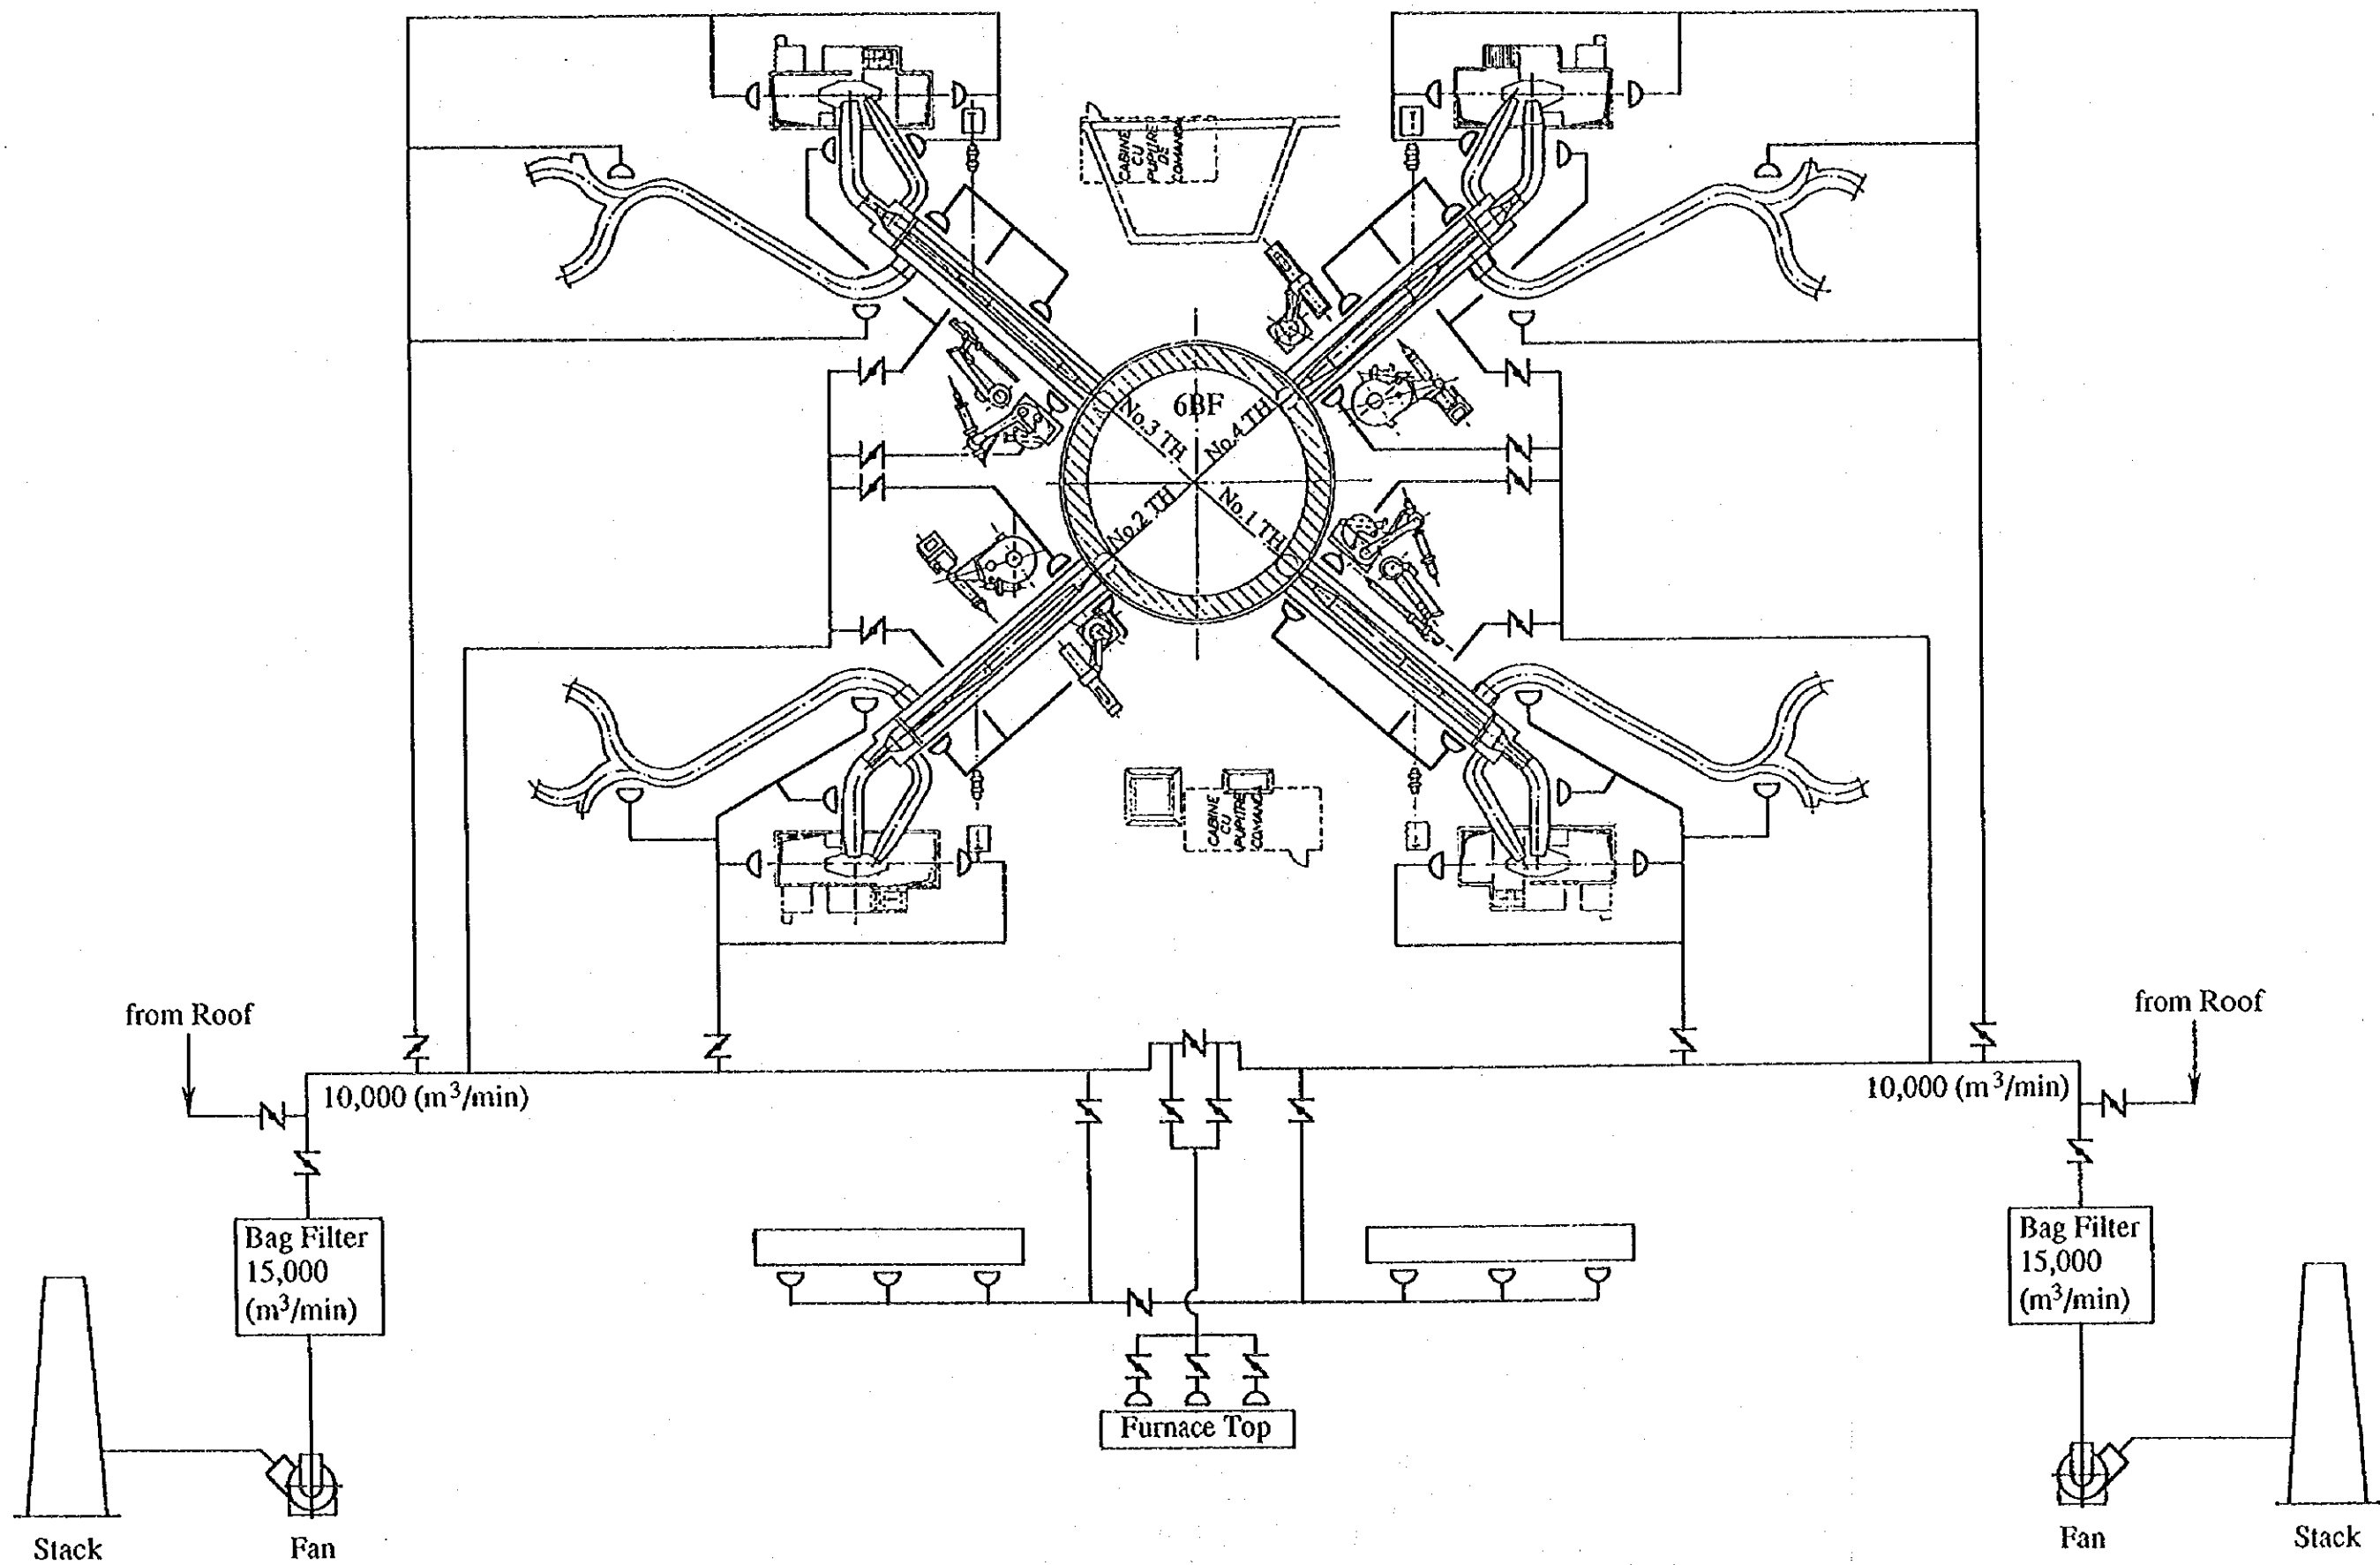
Schematic flow of dust collection system at casting floor of No.6 blast furnace
